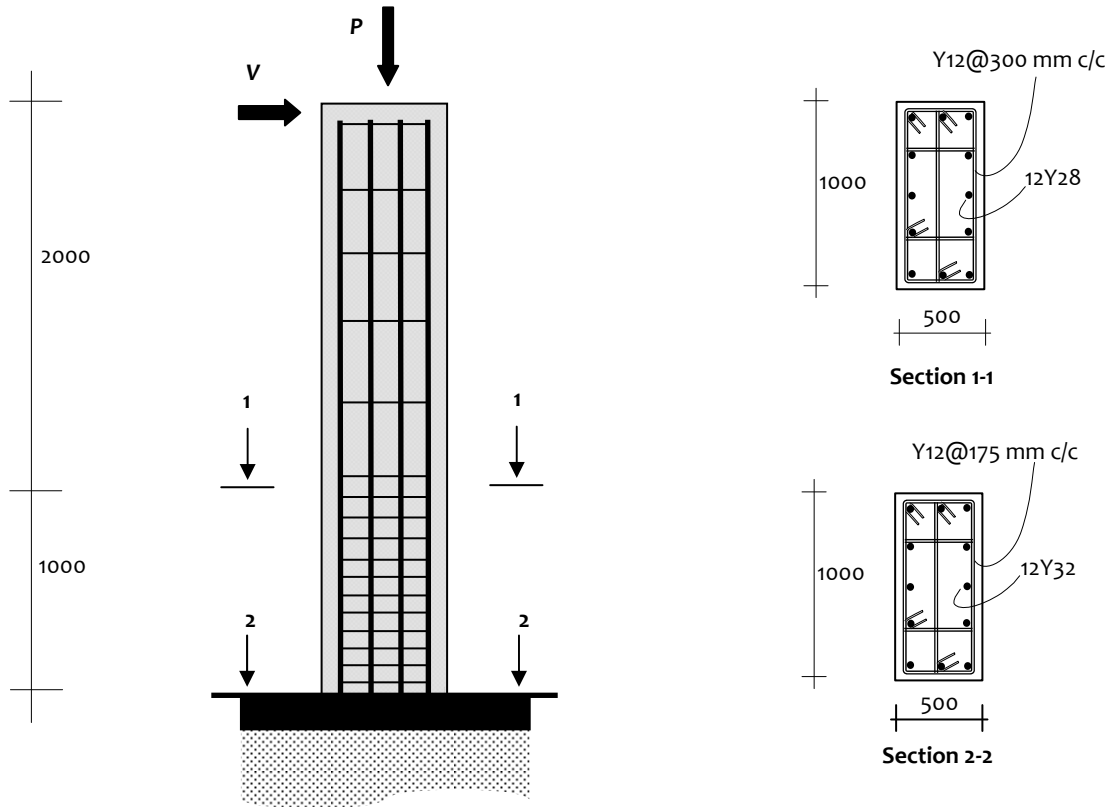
Schematic showing elevation and cross-section details of prismatic study pier
